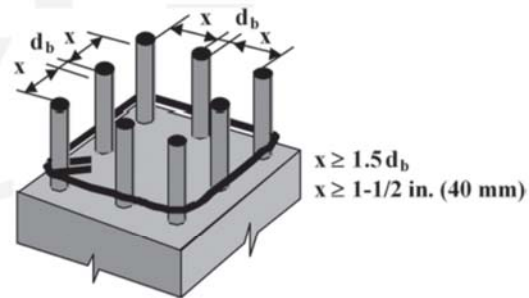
Clear spacing between longitudinal bars in columns.
